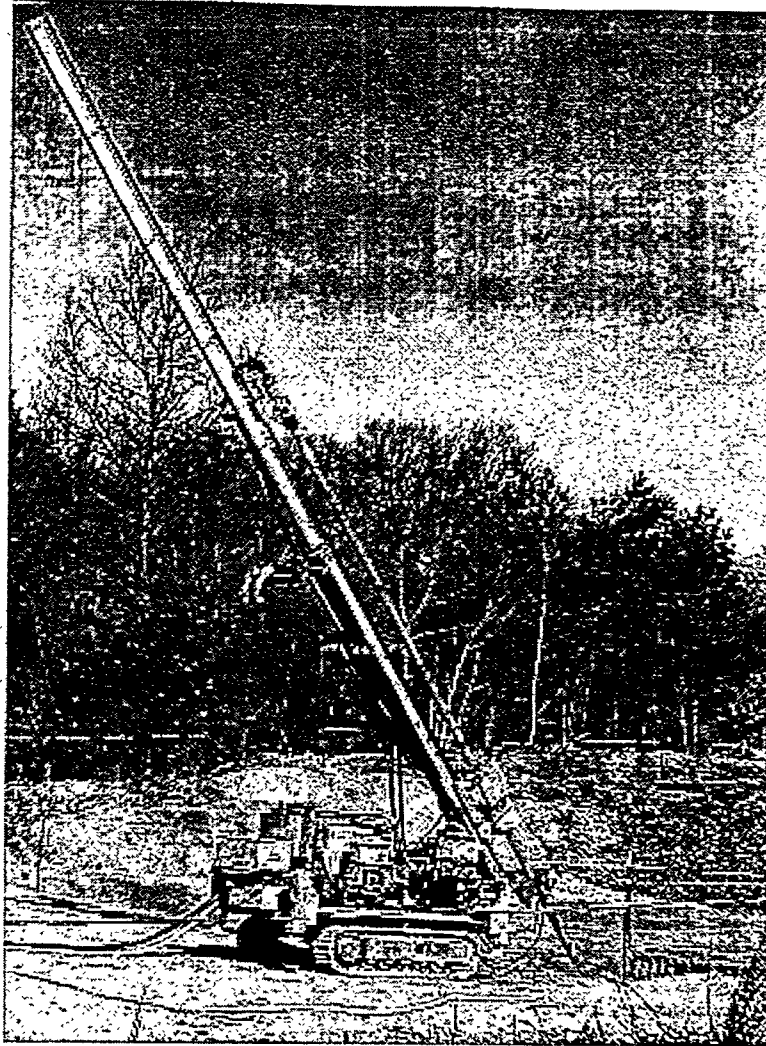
Photo of Jetting Rig Used During Emplacement Tests
